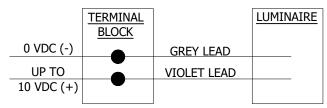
DIMMING CONTROL SCHEMATIC (C3)
